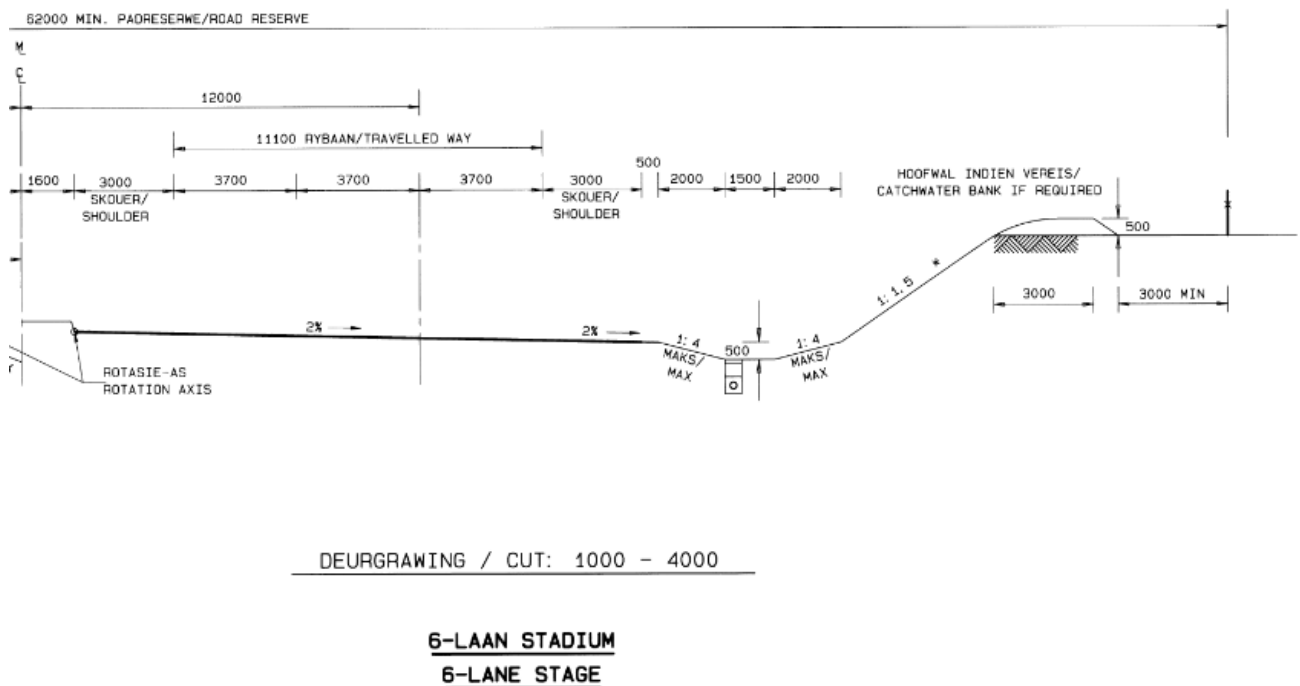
Typical Road Section (One Direction) (Knight Piésold, 2016)
